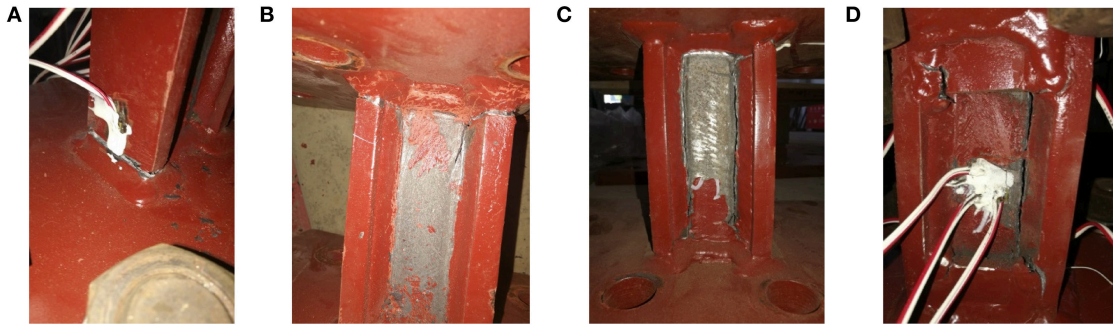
| Damage pattern of fractures: (A) flange-to-end plate weld; (B) web corners next to the welds; (C) web-to-flange weld; (D) Specimen M8.
